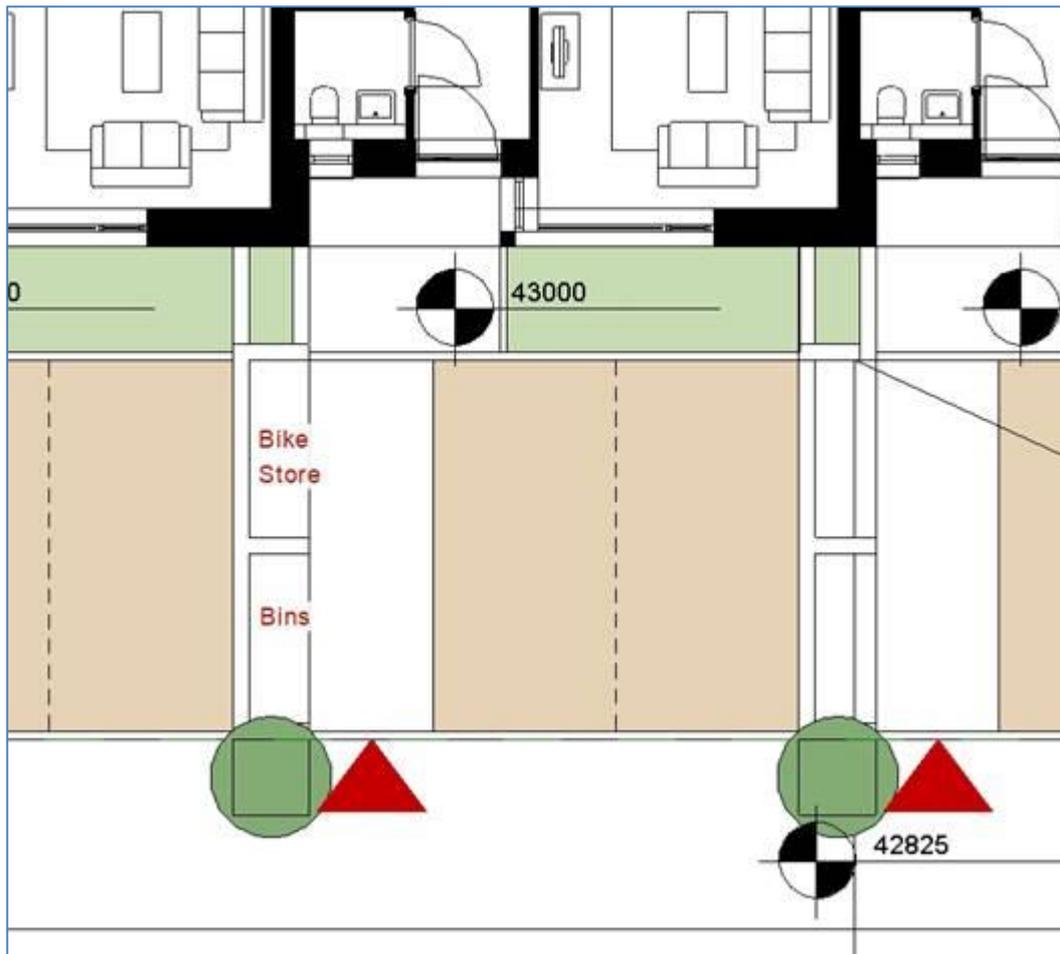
Concept Plan Detail for Proposed Bicycle Store for Houses
